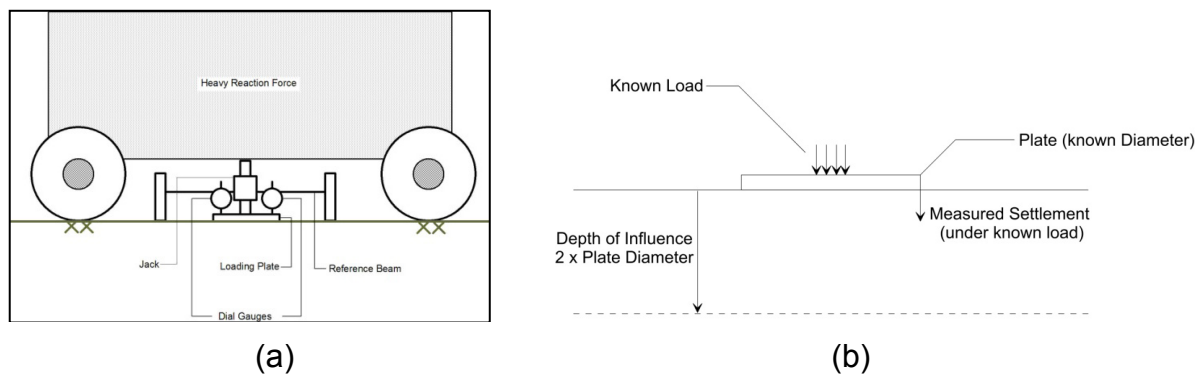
Plate Load Test equipment setup. (a) Equipment and required reaction load; and (b) concepts of PLT, showing load / settlement variables typically recorded during test (after Lacey, 2016).
